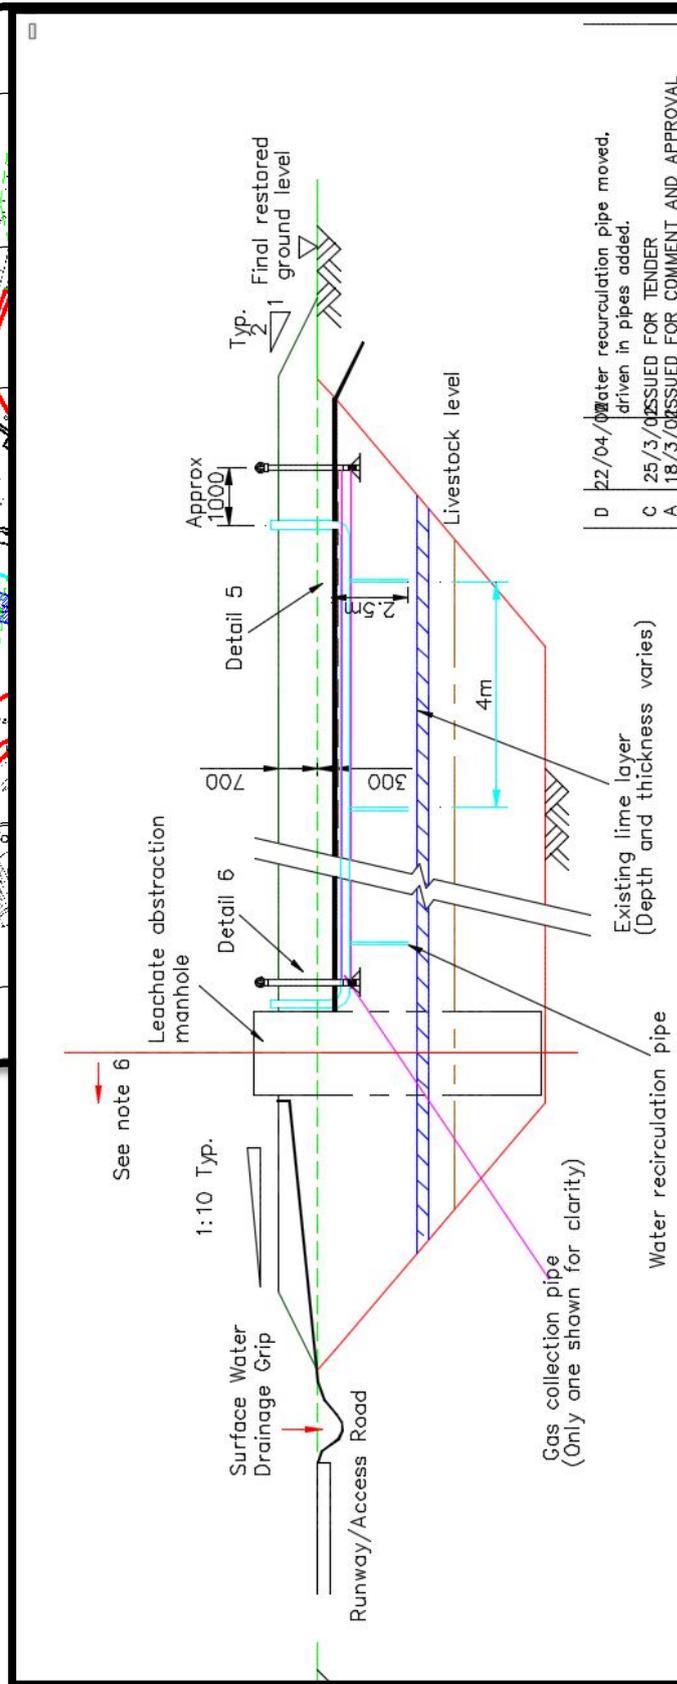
Burial Pit Design (cross section) Ridgeway Ground, Worcestershire
